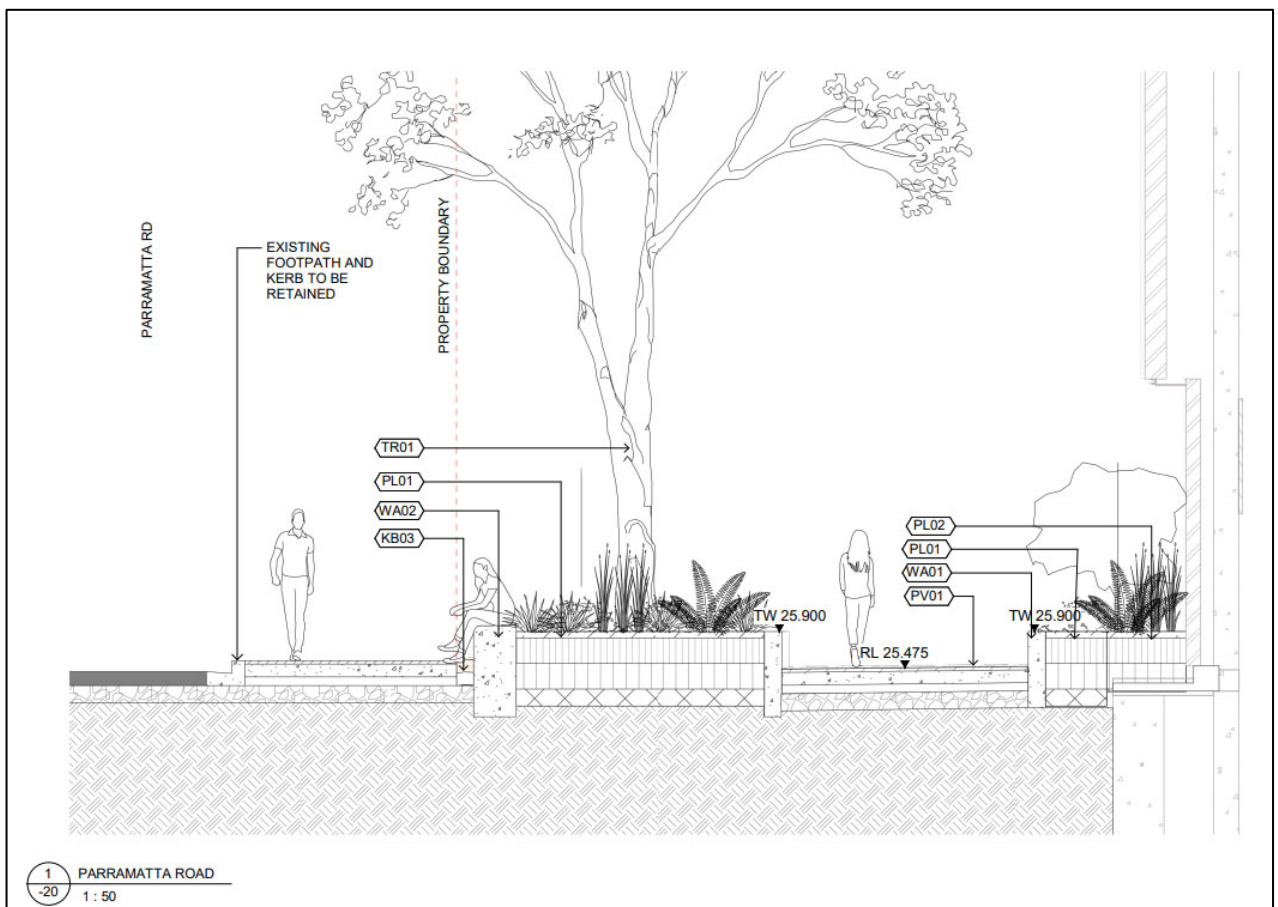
| Landscape plan section extract – Parramatta Road (Source: EIS)
